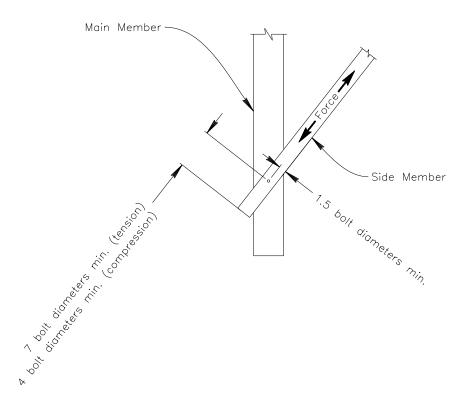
Bolted Connection Parallel-to-Grain Loading.
